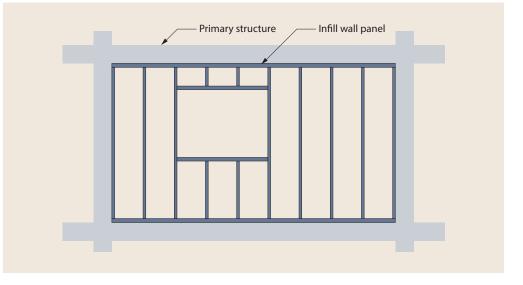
Typical infill wall panel within a steel or concrete primary structure The panels consist of a bottom track attached to the floor and a top track attached to the underside of the floor above. Vertical light steel C sections are fitted between the top and bottom tracks, typically at 600 mm centres (or reduced to 400 or 300 mm where structural design requires closer spacing). The top track must include allowance for relative movement in-service between the wall panel and the floor above. In some cases, the panels may be constructed such that they project past the edge of the primary structure.
